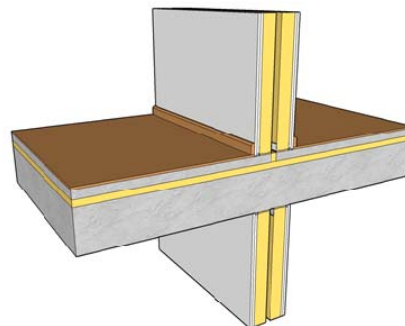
Lightweight wall structure and concrete floating floor on monolithic concrete slab
